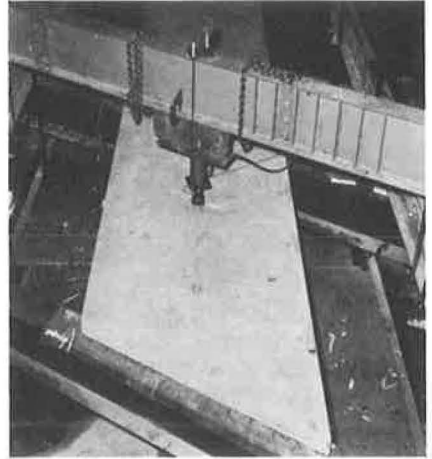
Testing to failure (test structure: 30°-1.0-0.5).
